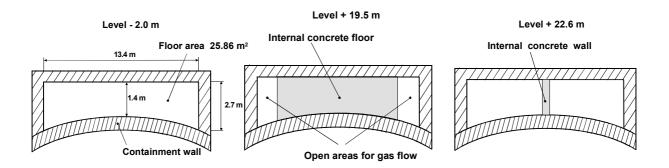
Cross-sectional pictures of room B.60.80 at three different elevations.
